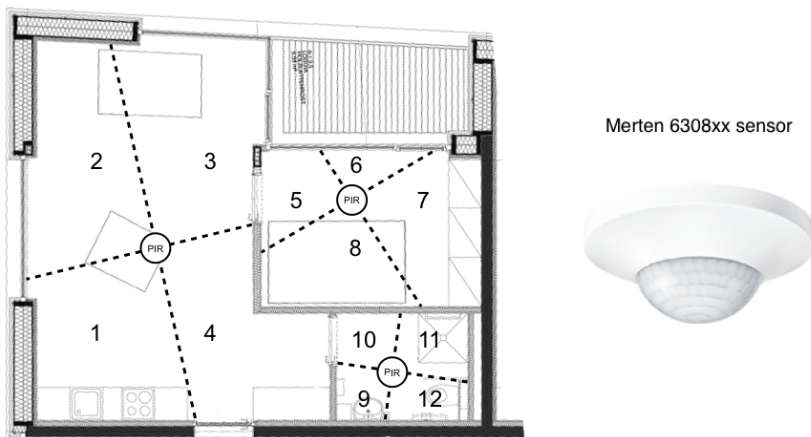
Plan of test apartment with numbered PIR-sensor sections (total 12 sections)
